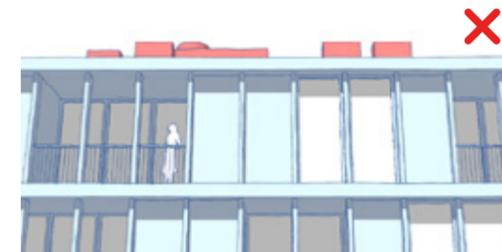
Plant and services on roof. Seeing plant equipment from street level can have a negative impact on the character of the street.
